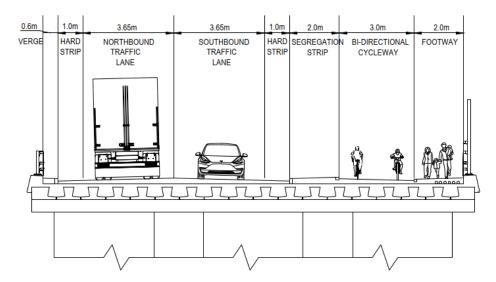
Typical highway cross sections over River Thames Bridge and viaduct
